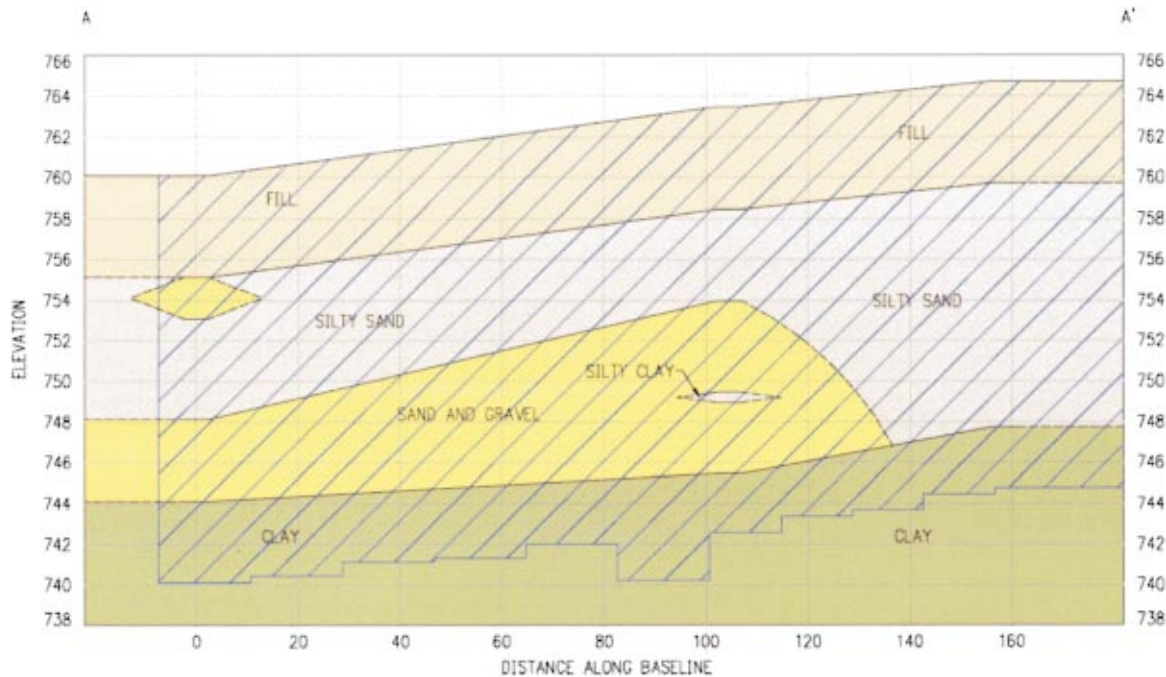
(Color) Cross section of site soils with overlay of containment wall
